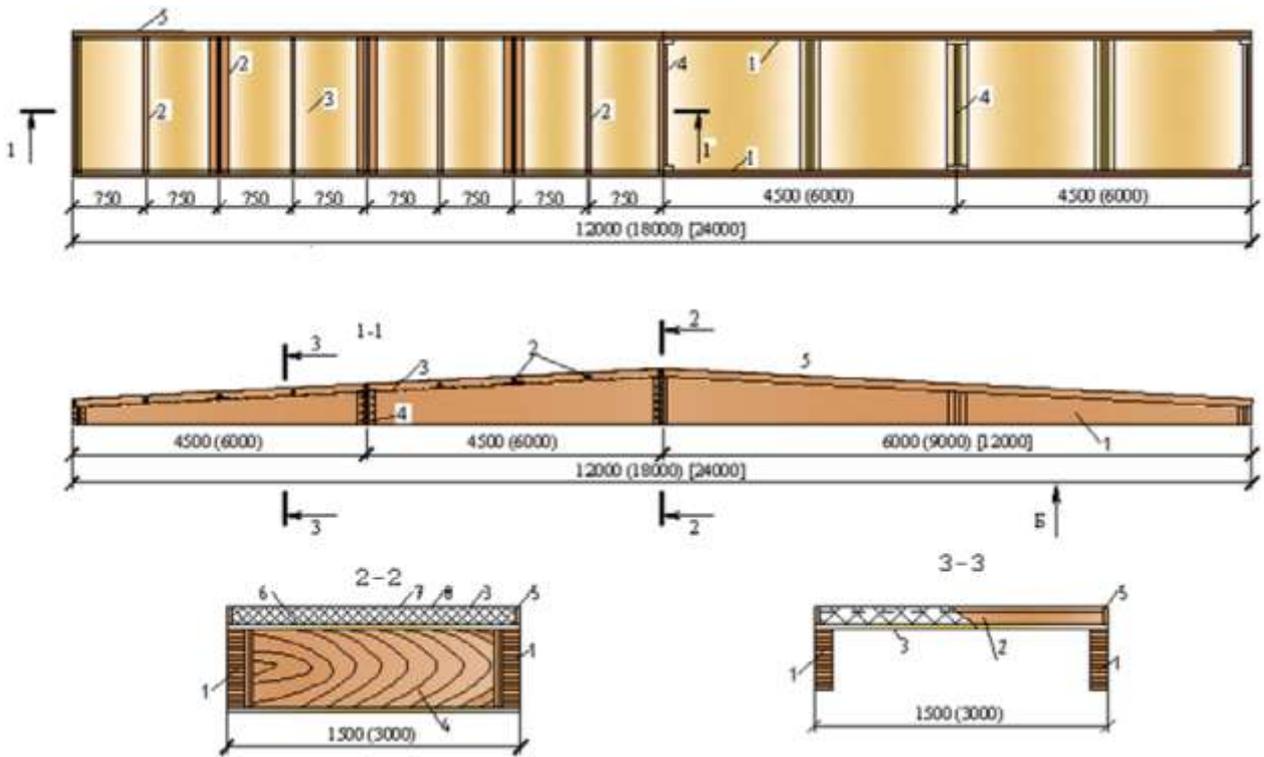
The slab with the adhesive board ribs: 1 – main ribs, 2 – cross ribs, 3 – plywood boarding, 4 – apertures, 5 – frame ribs, 6 – vapour sealing, 7 – warmth-keeping jacket, 8 – soft waterproof mat
